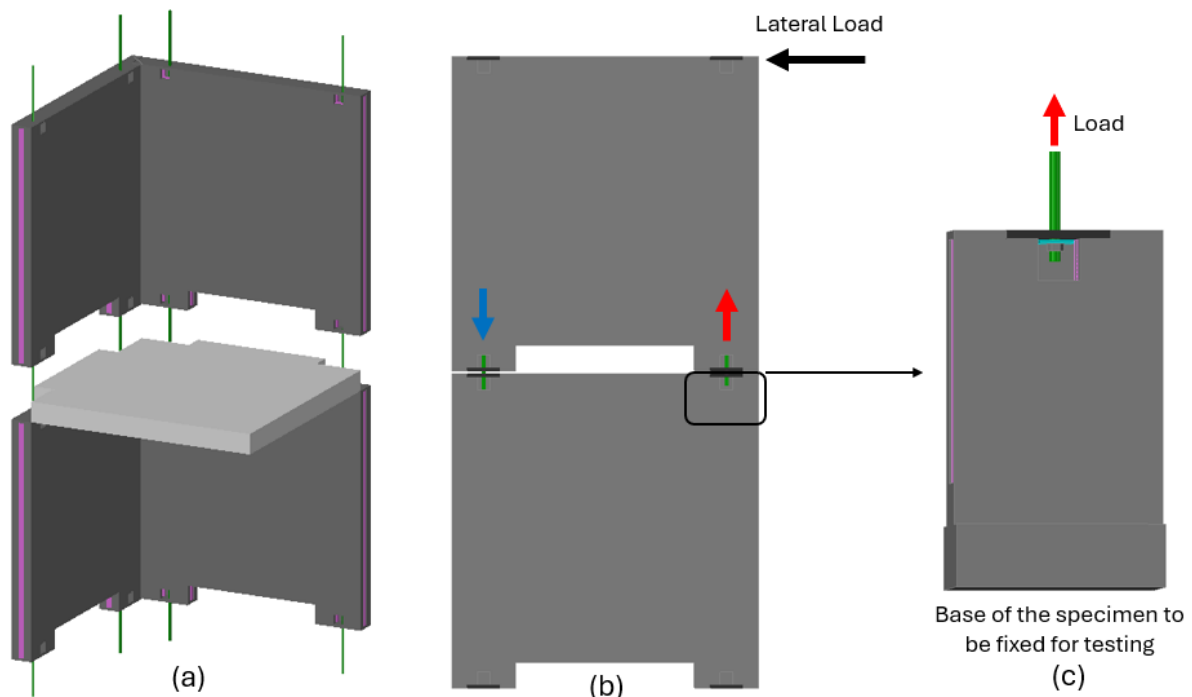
Proposed structural system: (a) general schematic layout (b) Wall to wall connection (c) Representative section of the wall for testing connection detailing
